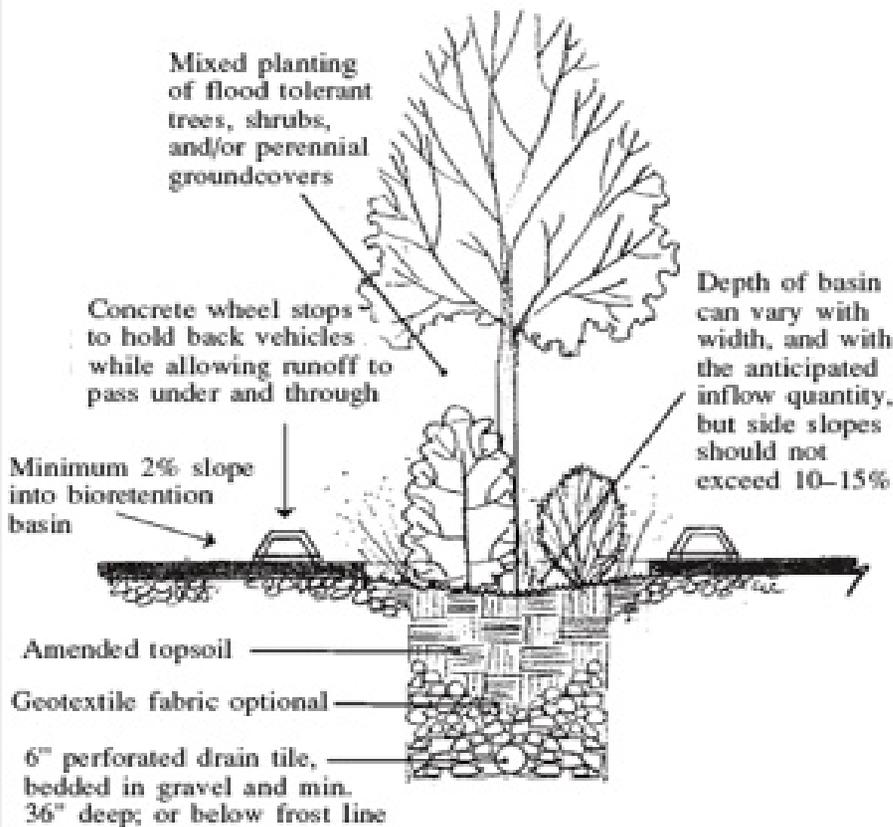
Cross section of a parking lot "wetland island" for bioretention, with an 8-foot width.
